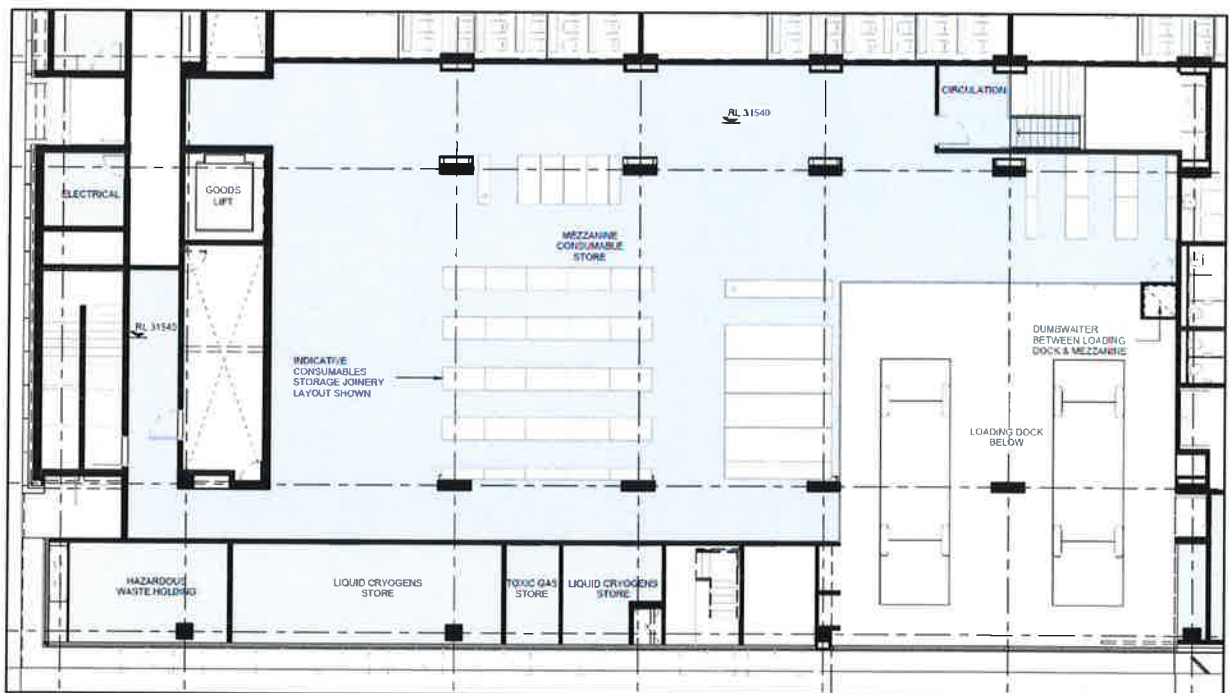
Approved Ground Floor storage area (Source - SSD 7518 EIS)
